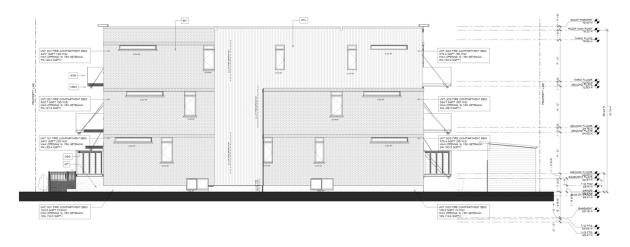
Right Elevation of Proposed Building (Source: Grant Henley Design Group)
